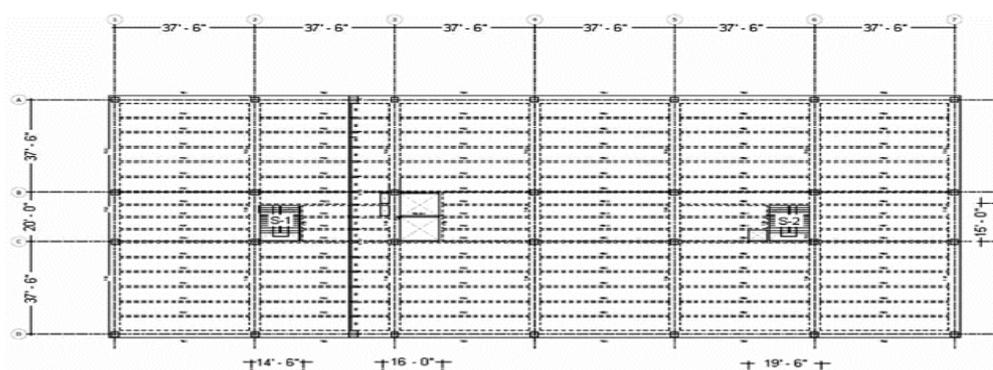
The plan of a reinforced concrete building (from DoD 2013)
